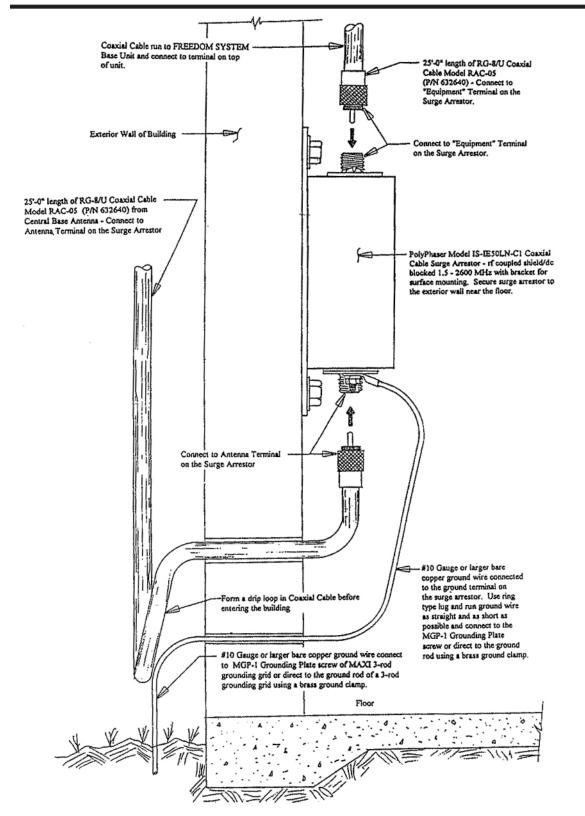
Mounting & Wiring of PolyPhaser Surge Arrestor
